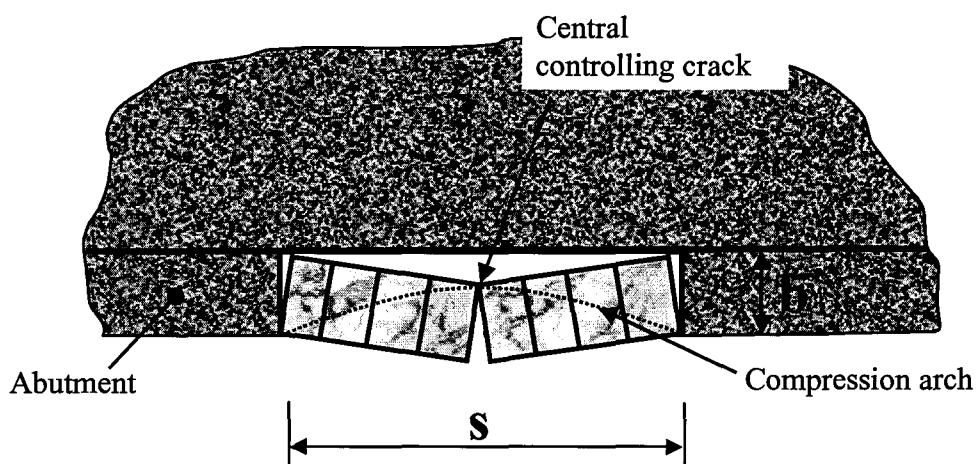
Voussoir beam geometry for hangingwall beam analysis.
